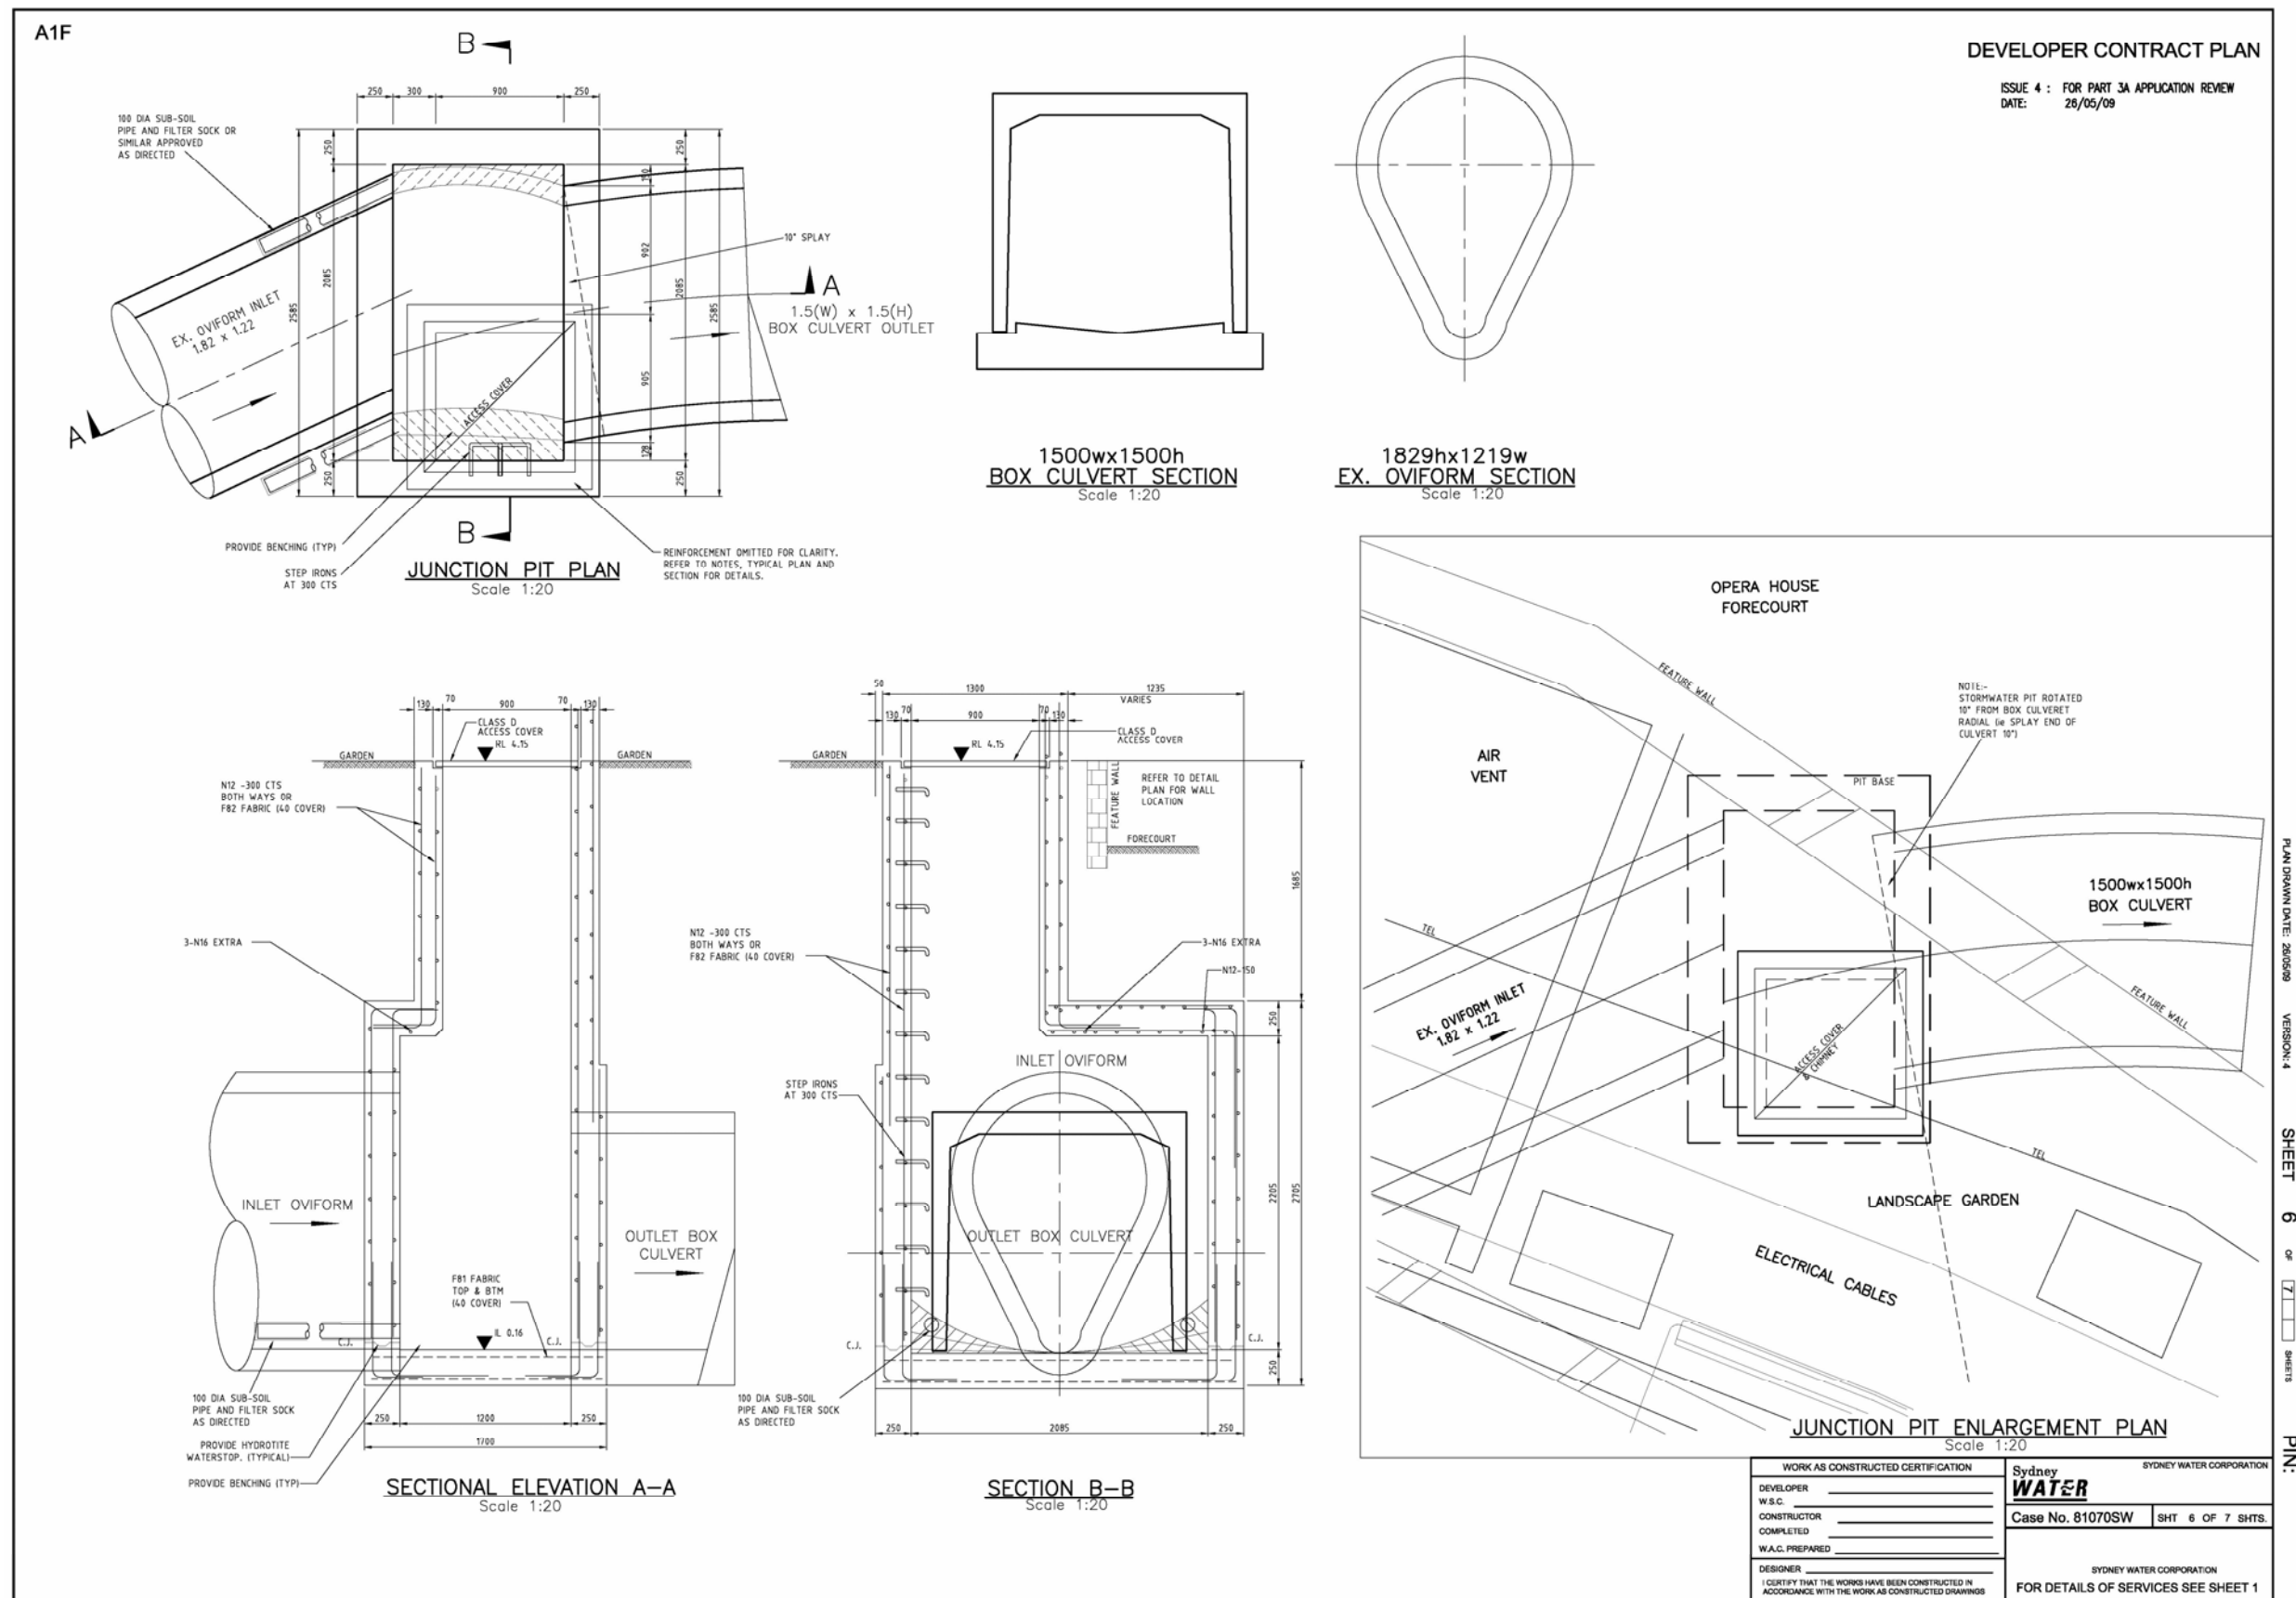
Drawings of the proposed diversion of the Bennelong stormwater channel, including details of the new junction pit.
